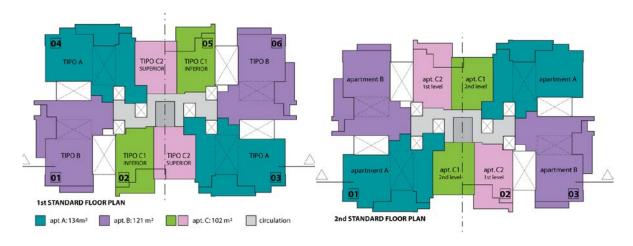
Diagram of standard floor plan: lower (left) and upper (right) levels (not to scale).
